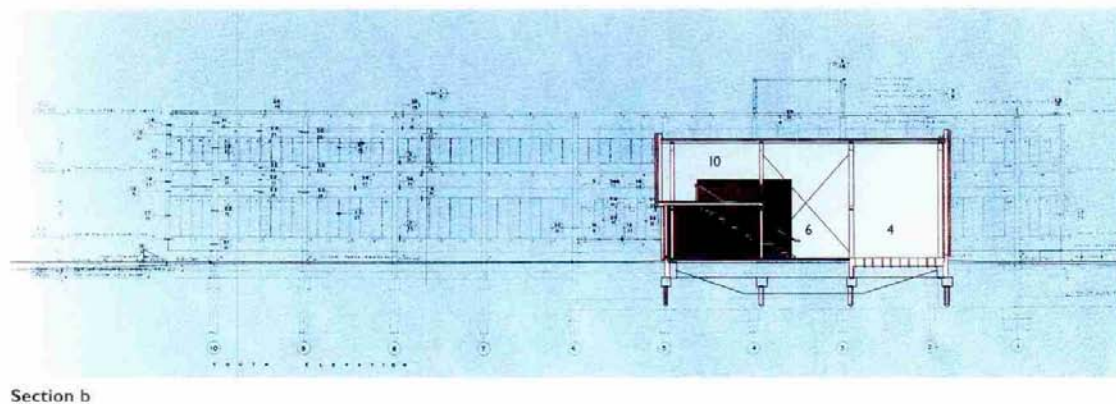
| The Centre for Architectural Structures and Technology, plans and sections: Source, "Thinking with Matter:" West.
